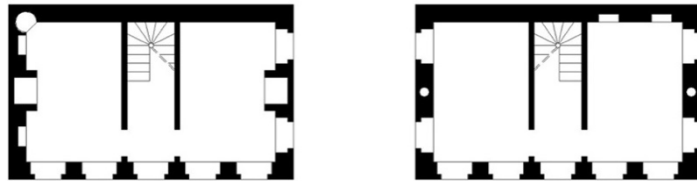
“Sakız House” plan; (Source: Re-drawn by the author based on Akçura, 1972; Gündüz et al, 2001 and archive of Erhan Acar)
